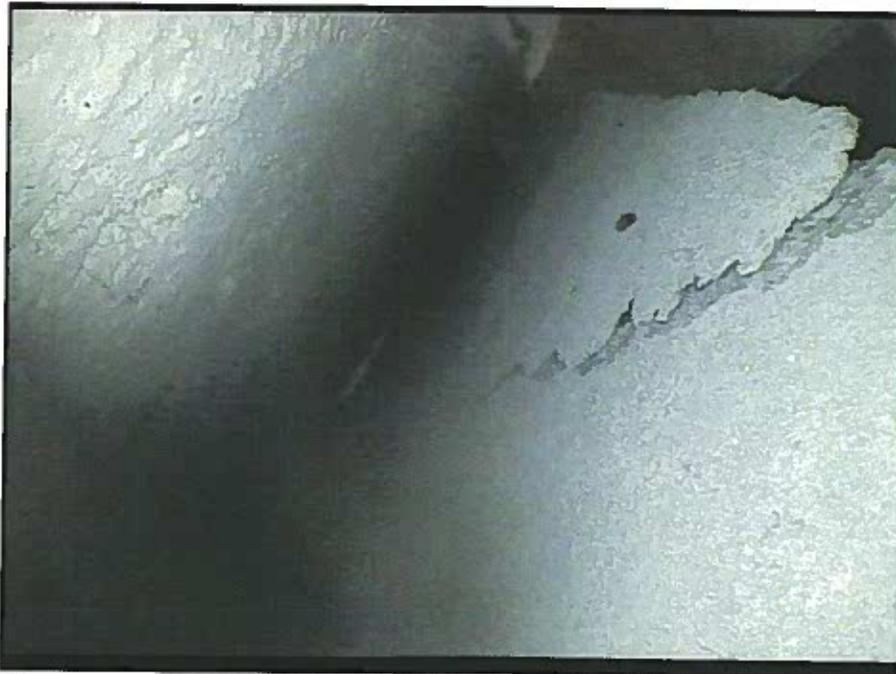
Typical Crack Observed in the Exterior Face of the Parapet
